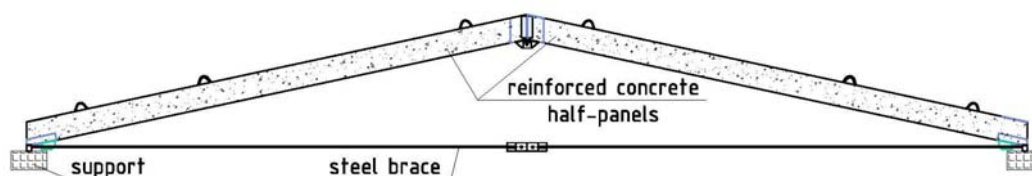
General view of a reinforced concrete triangular arch with a brace
